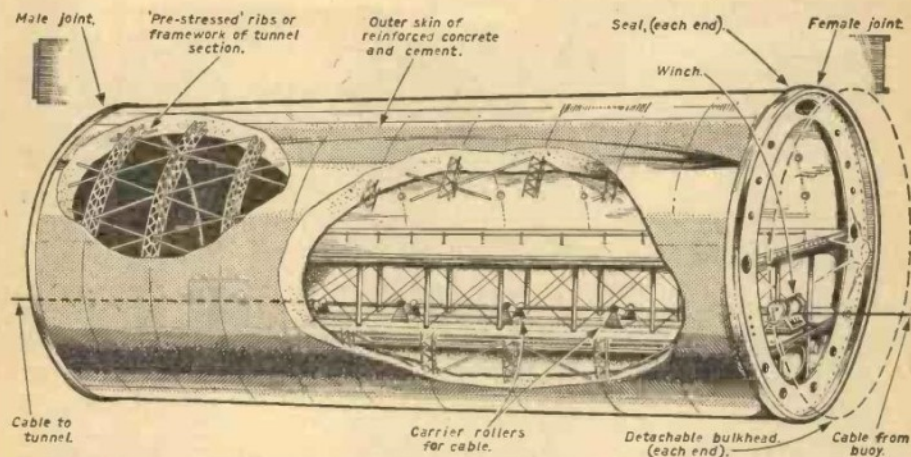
Showing the framework of a section of the tunnel. The winch, carrier rollers for cable and bulkhead doors are removed when section is in position.
